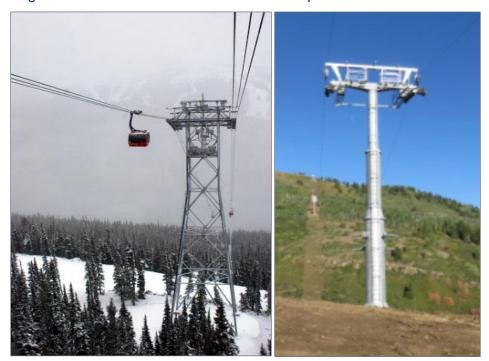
Gondola Alternative A – Example of Gondola Towers
